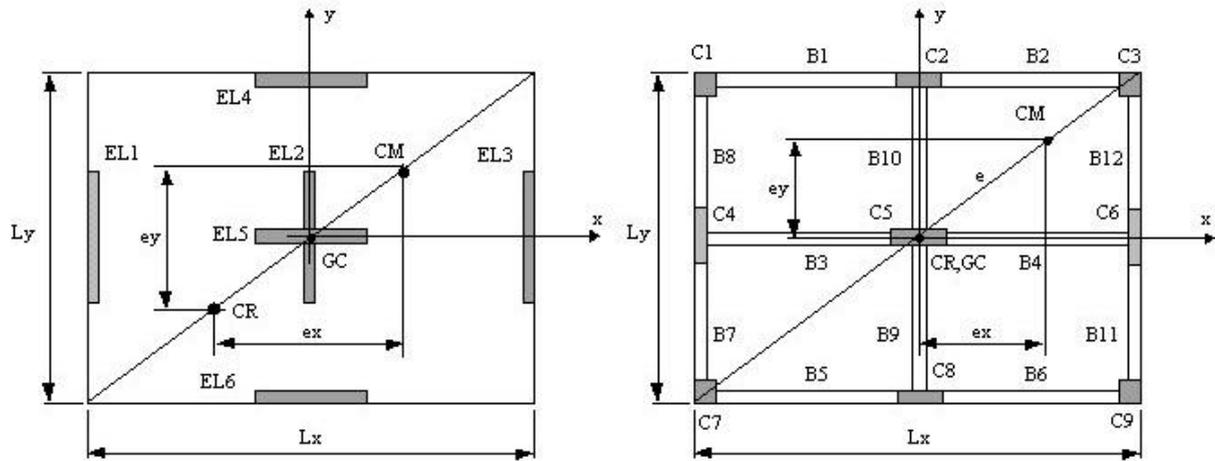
Geometry of systems analyzed: (a) Shear-beam model (b) Reinforced concrete building
